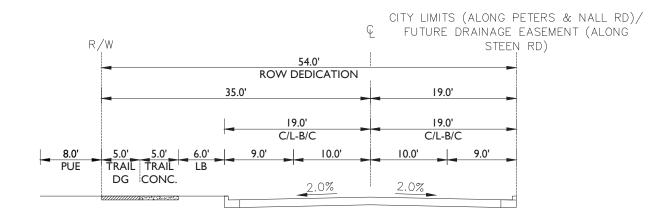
MODIFIED COLLECTOR STREET WITH TRAIL - 54' ROW
